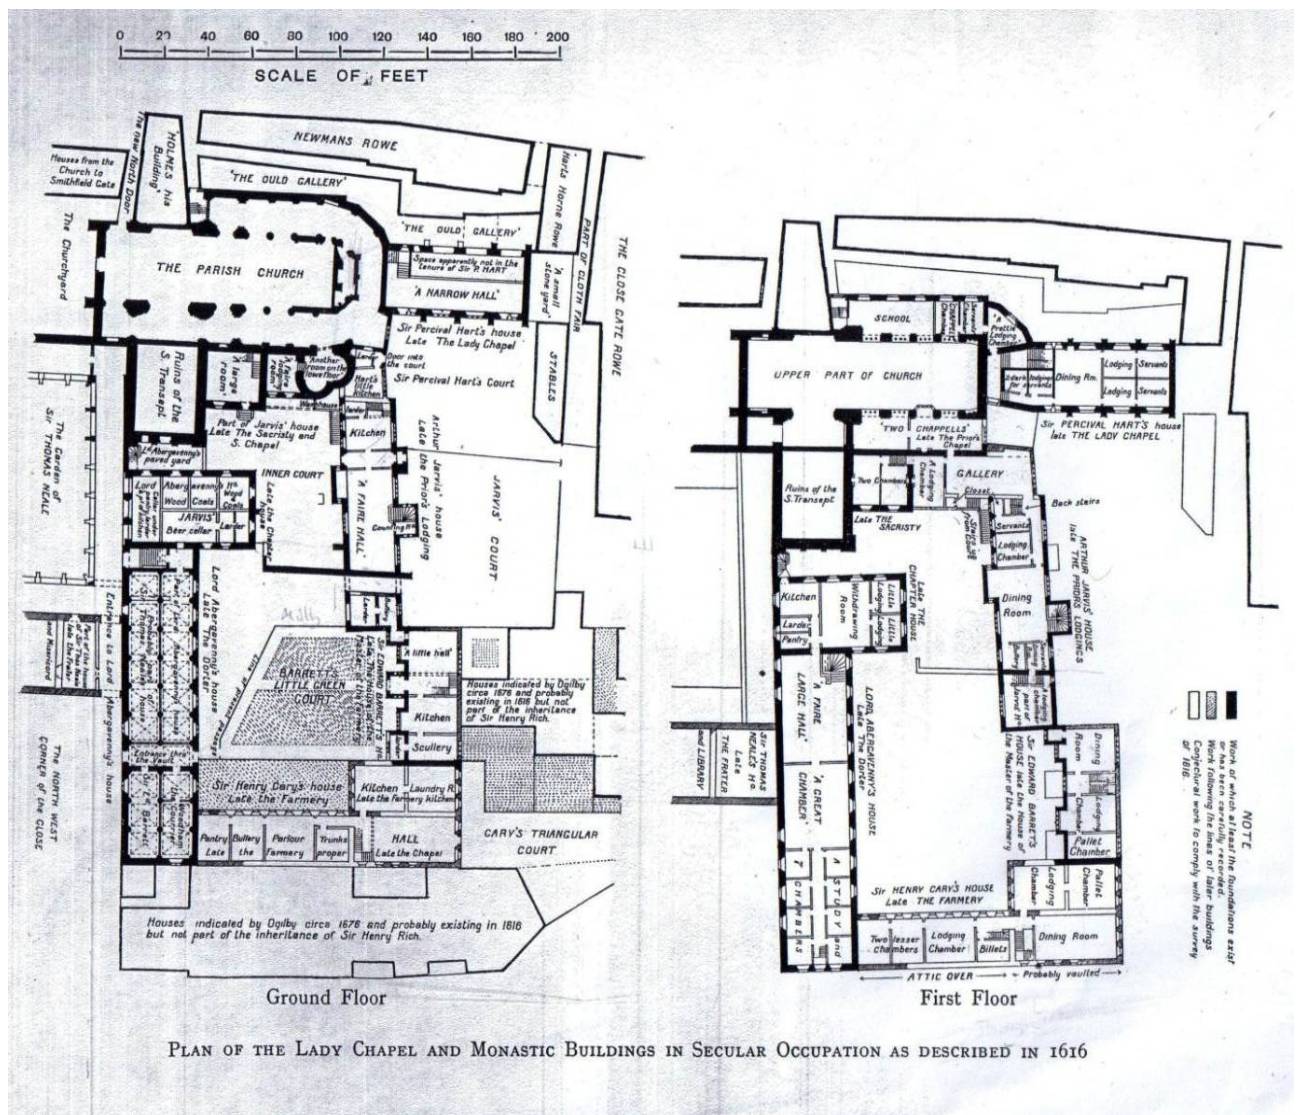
Plan of St. Bartholomew's Lady Chapel and monastic buildings 1616
